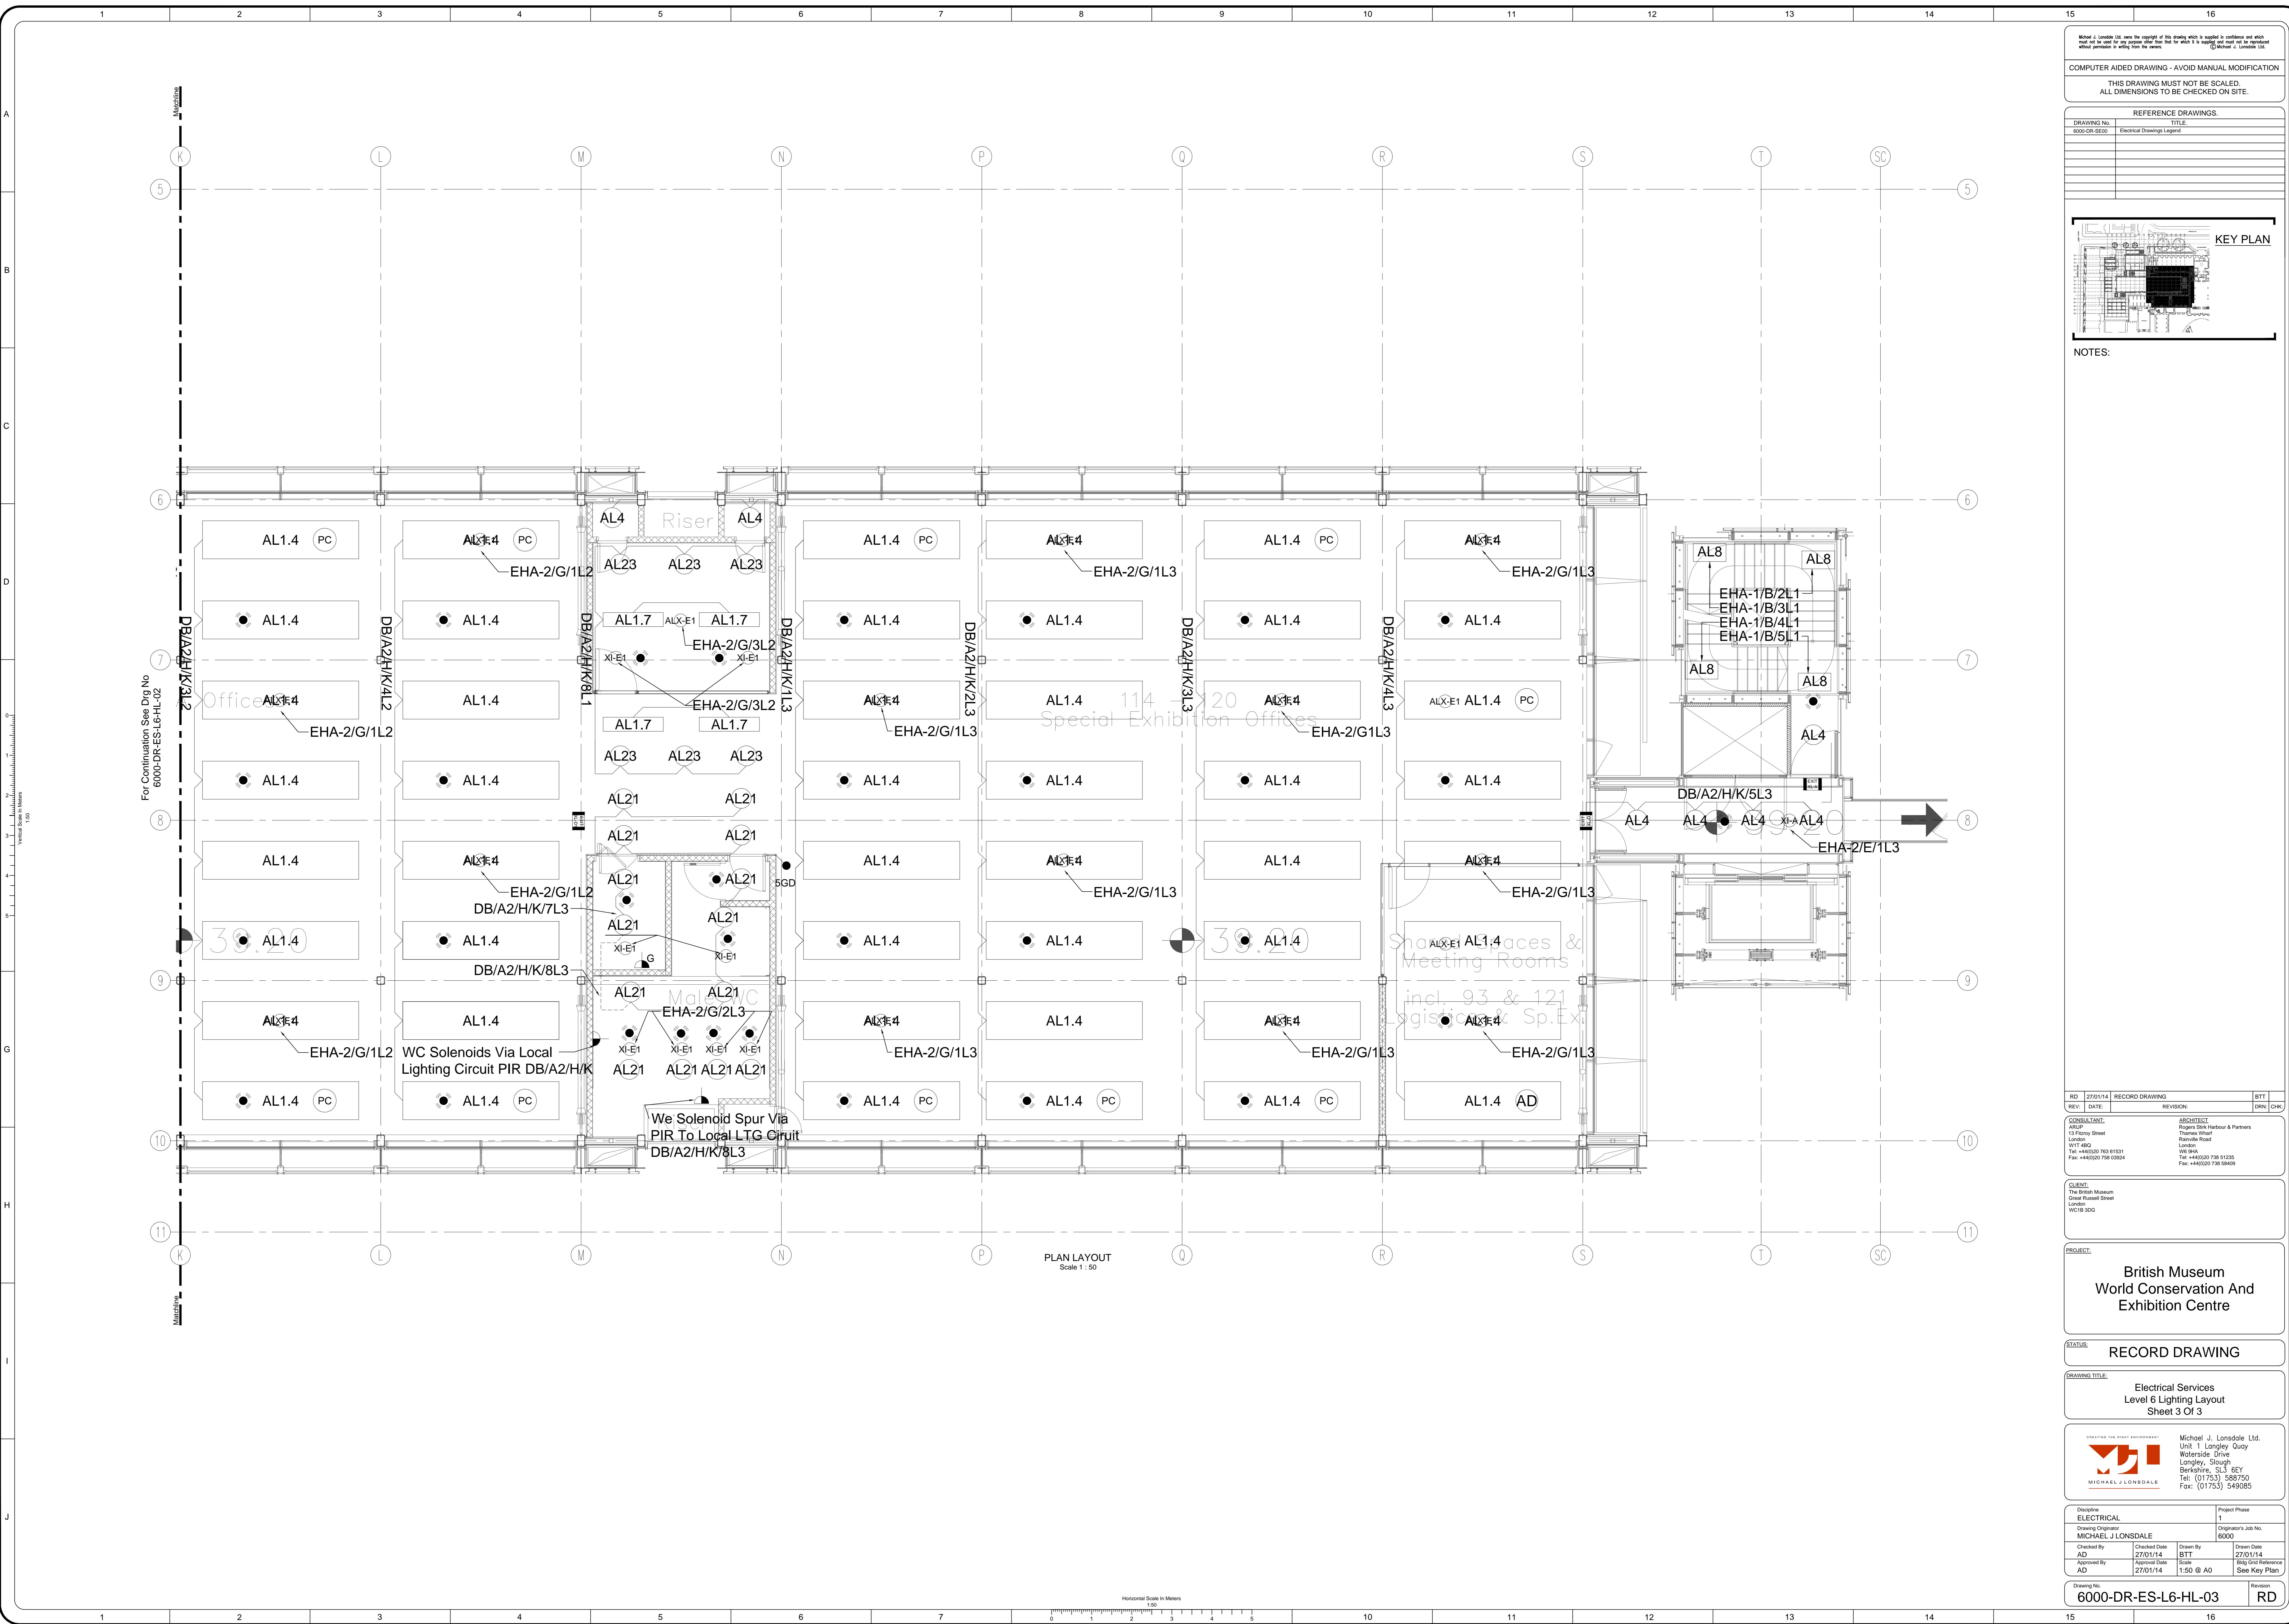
DR-ES-L6-HL-01 Revision RD
